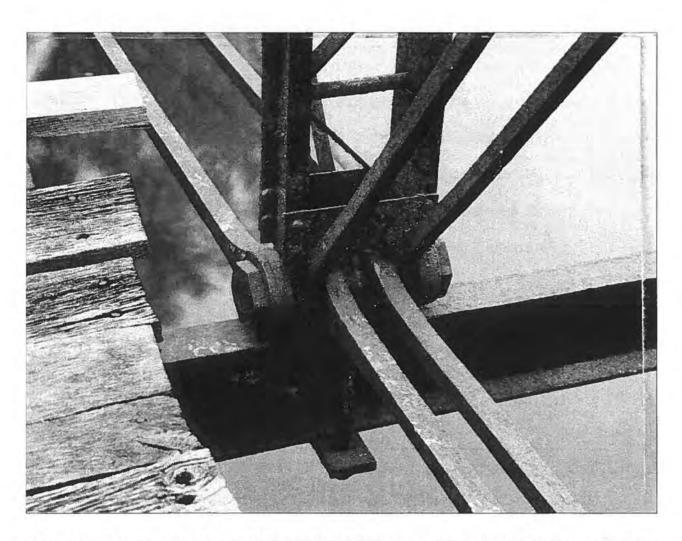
Pin-connection detail of an overhead Pratt truss erected in 1877; photograph shows vertical post, bottom chord, eye-bars, and floor-beam hanger; White River Bridge, Burlington, Racine County. (Source: HAER No. WI-16).
